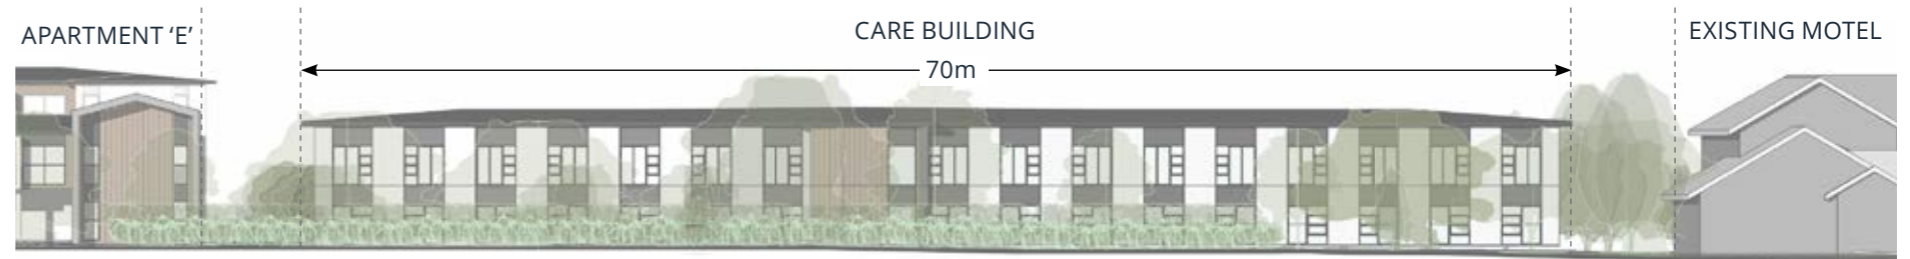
PREVIOUS APPROVED SCHEME - CARE BUILDING ELEVATION FROM BOTANY
